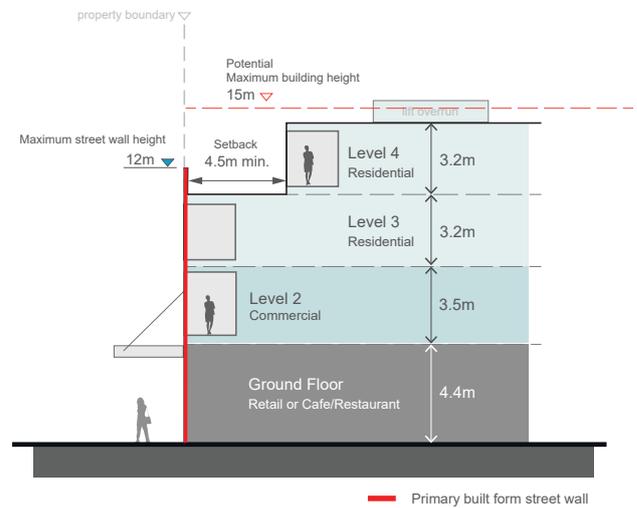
Sections showing existing and recommended modified building heights and setbacks
